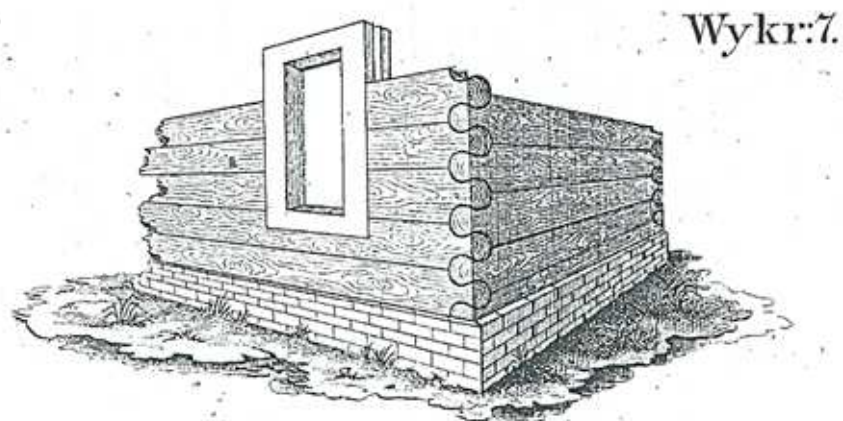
Framework construction of buildings in Kaunas (perspective) [3]
